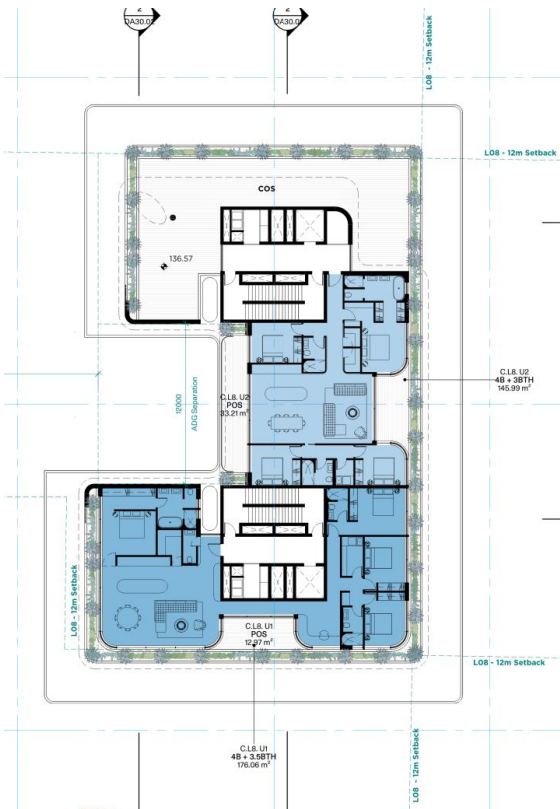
Proposed new Level 8 units (Source: PMDL Architects)
